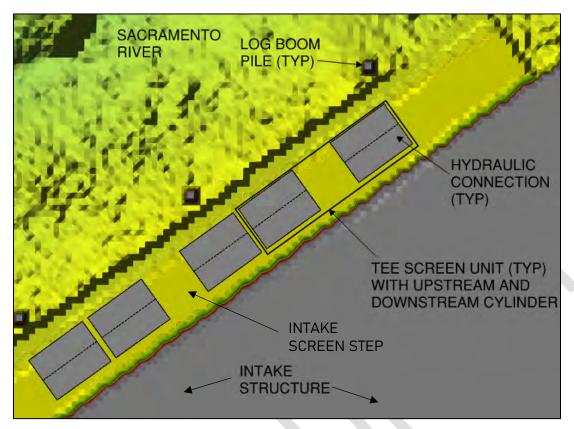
Model Plan View of Tee Screens With Hydraulic Connections
